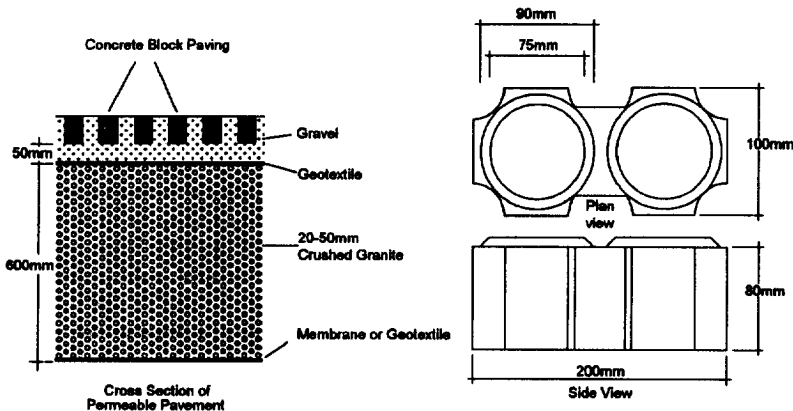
Cross section through permeable pavement, and detail of concrete blocks.
